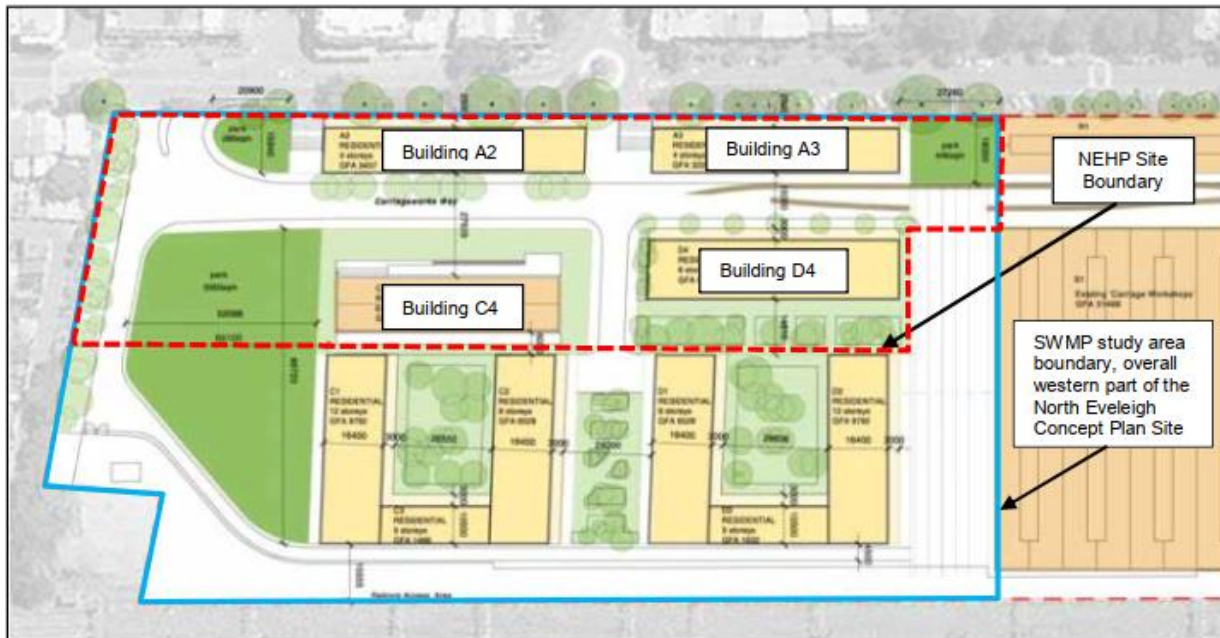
North Eveleigh Affordable House Project Concept Plan (2013)
